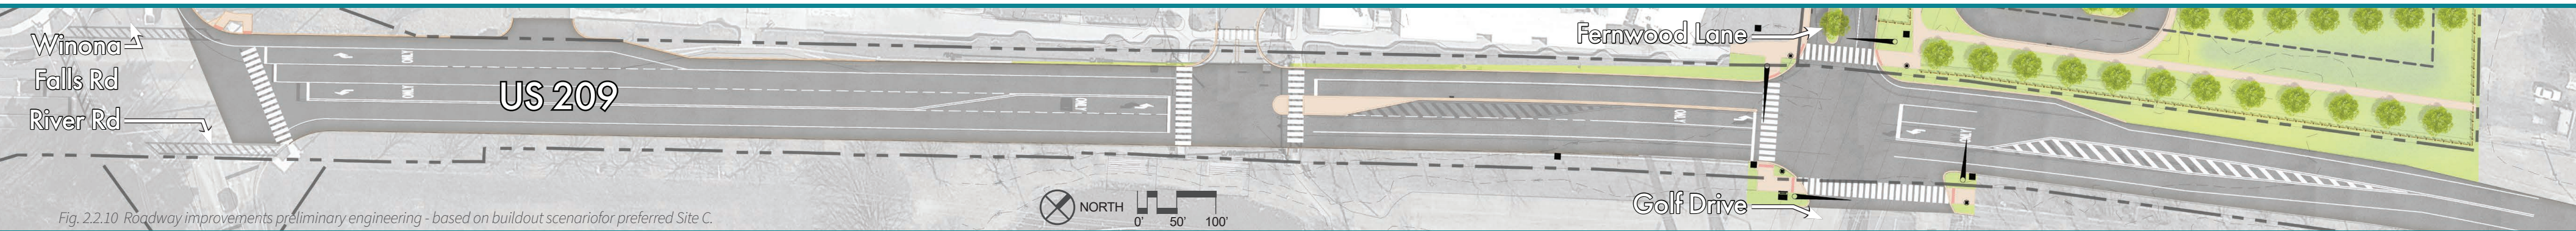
Roadway improvements preliminary engineering - based on buildout scenario for preferred Site C.
